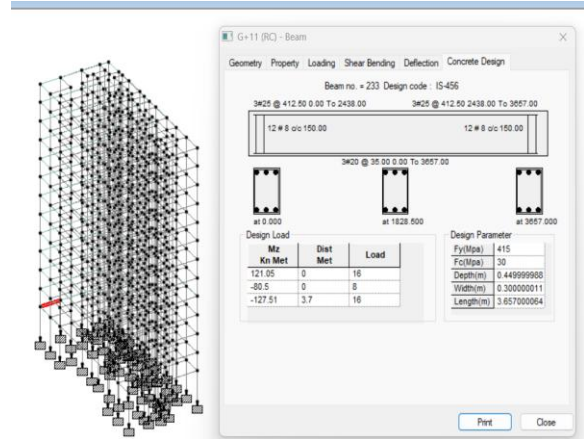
Detailing Diagram of beam in Ground Floor – G+11(RCC)
